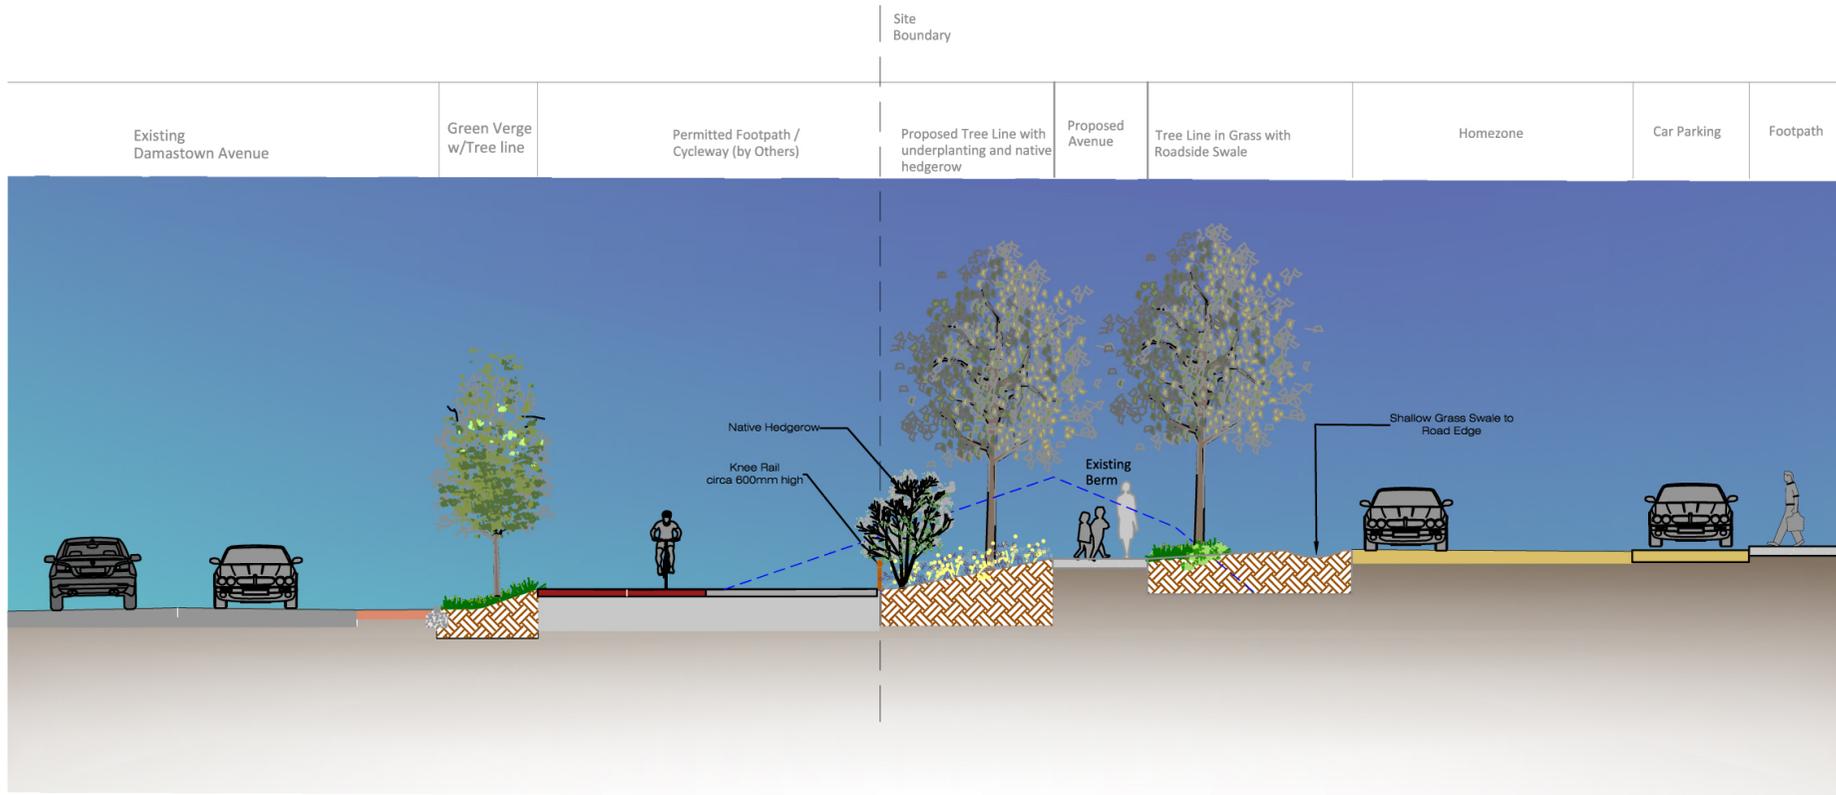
Typical Cross Section through northern boundary with Damastown Avenue
